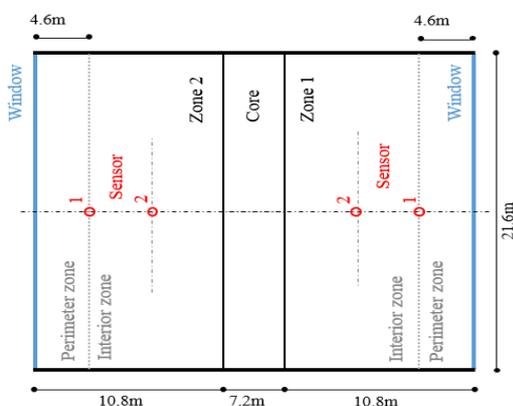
Floor plan detailing daylight sensor locations of a small-scale building
